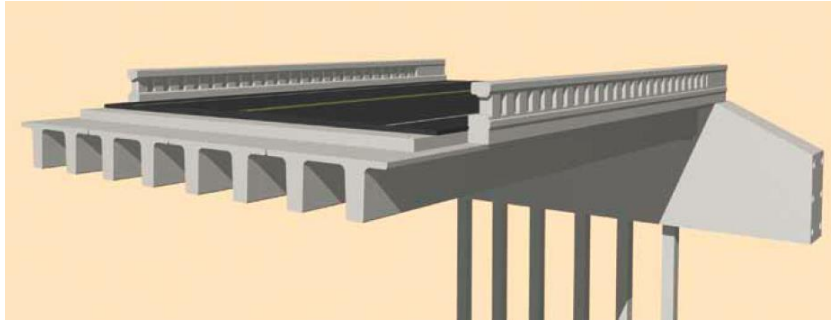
NEXT beam bridge concept constructed on a precast concrete integral abutment. Similar to a double-tee, each section contains two webs (Culmo and Seraderian, 2010)
